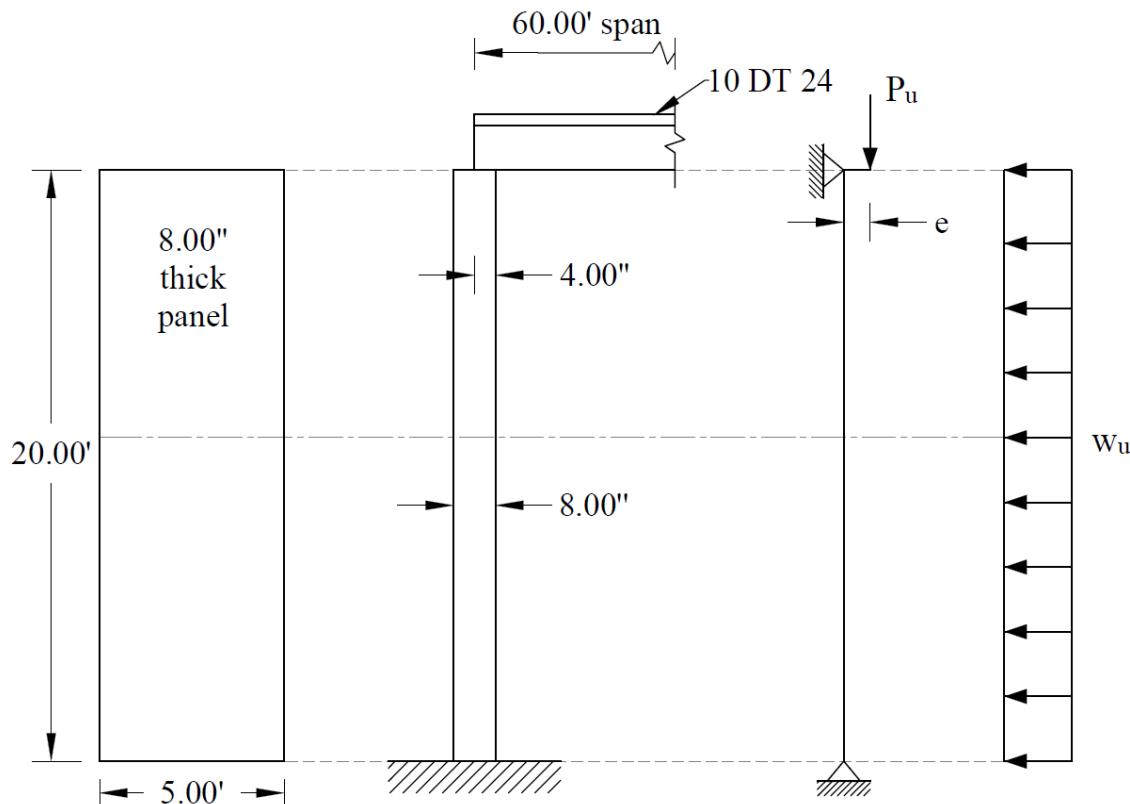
Reinforced Concrete Precast Wall Panel Geometry
